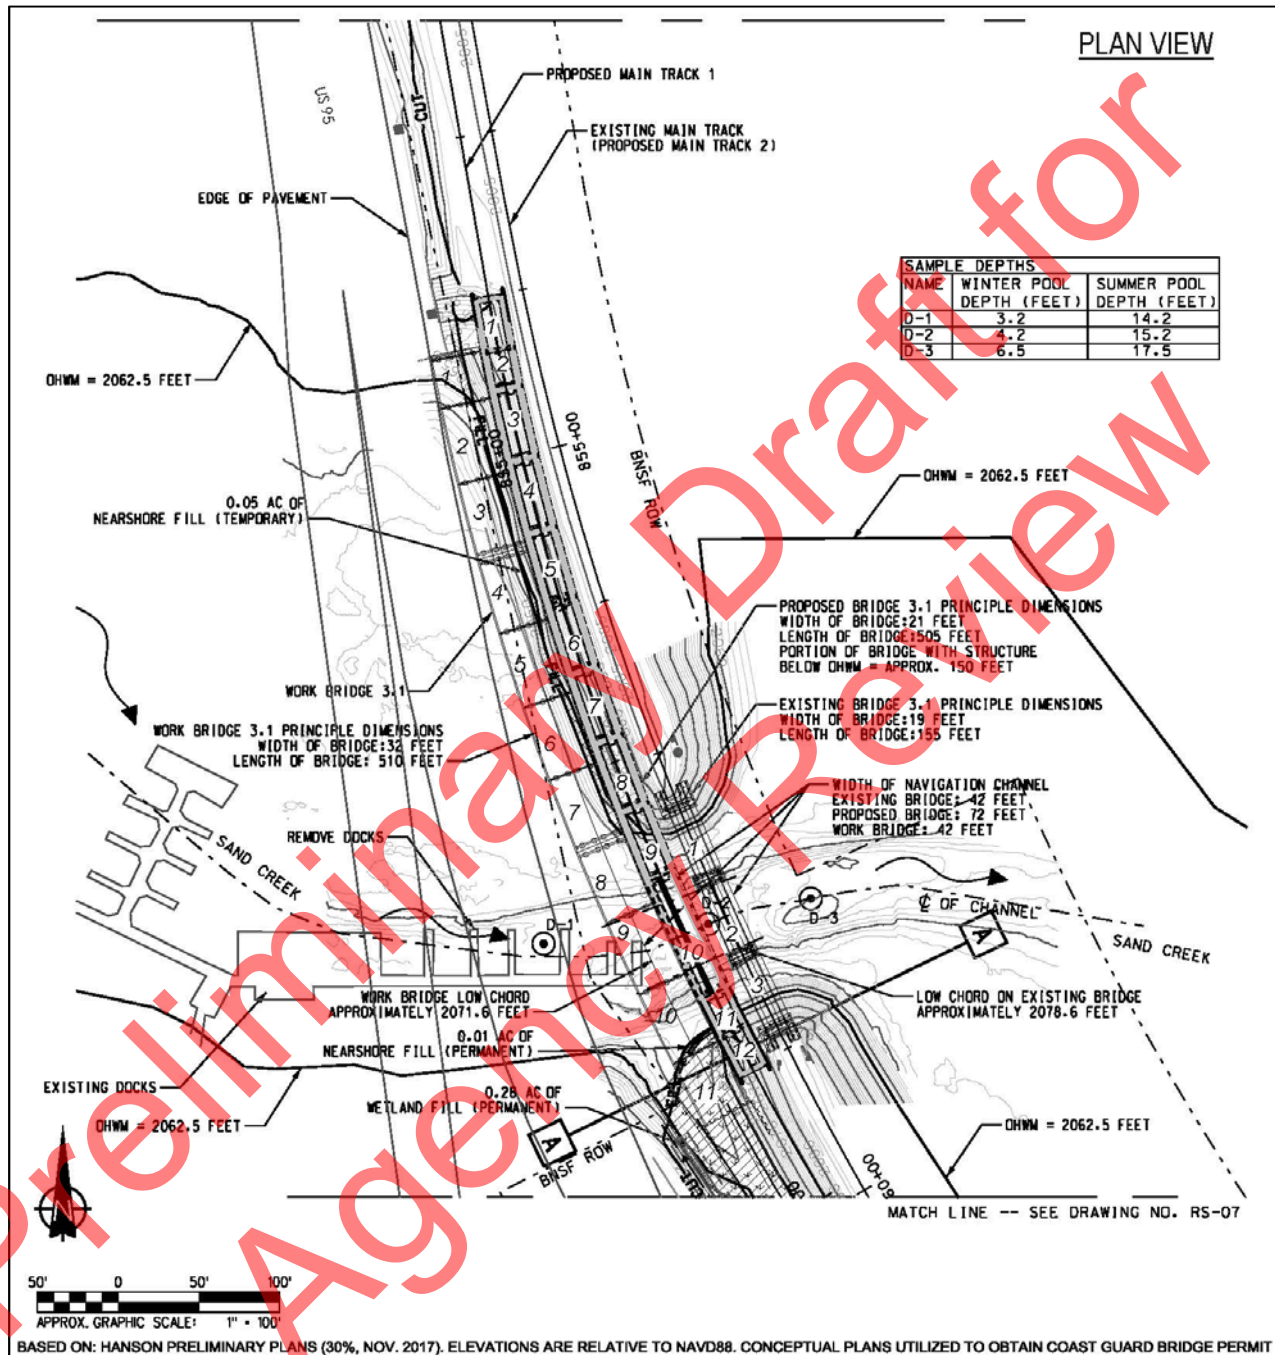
Plans for proposed Br 3.1 – temporary and permanent structures
